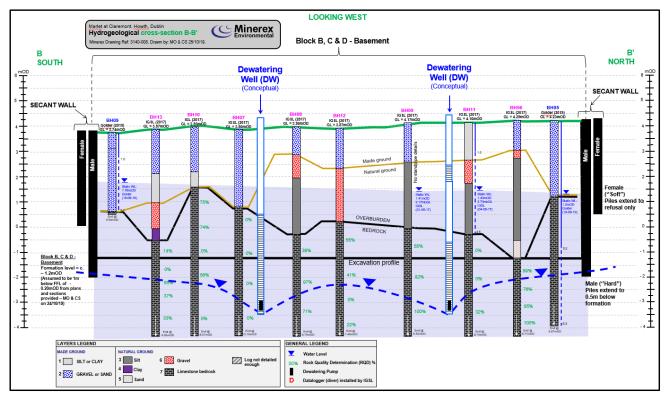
Section B-B- Ref to Figure 12.2.14
